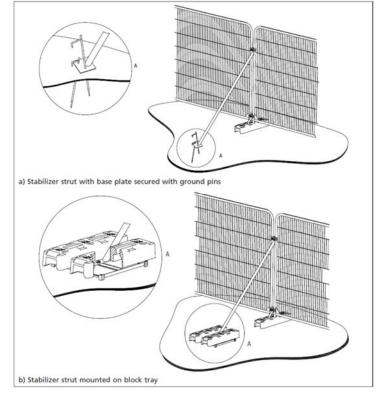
Above ground- stabilizing system (Source: Figure 3 from BS5837 – Examples of above ground stabilizing system
